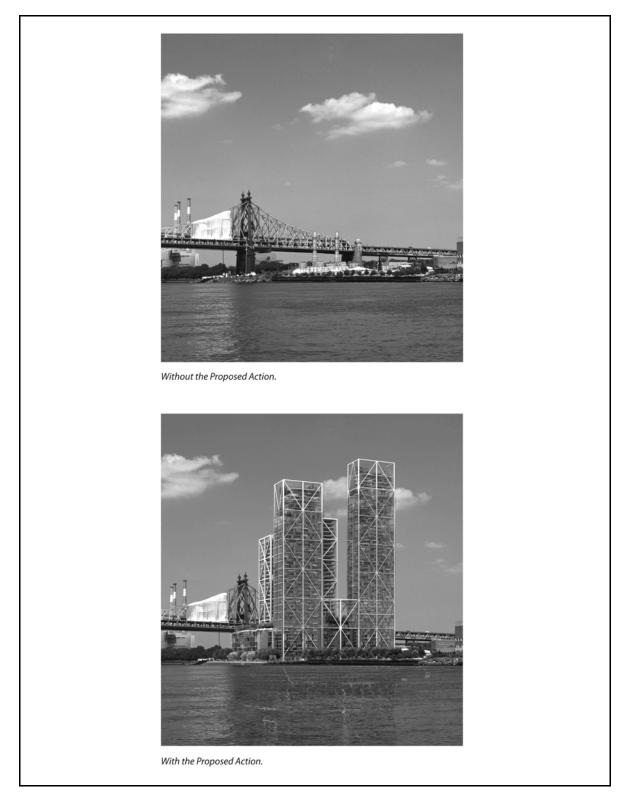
Views Toward Queensboro Bridge and Project Site (Without and With the Proposed Action)
